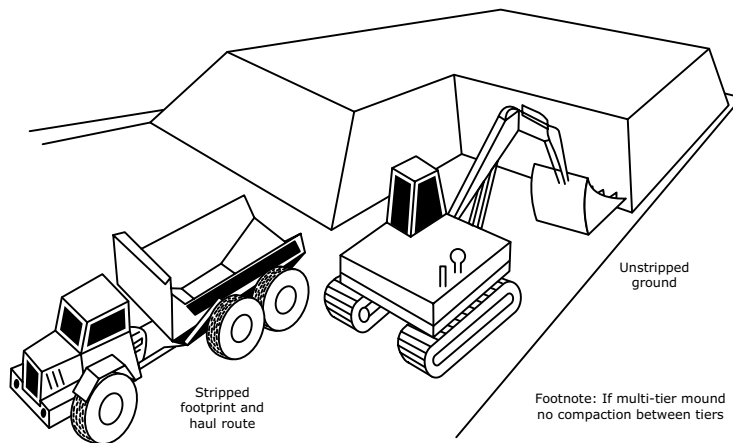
Excavation of soil storage mounds with front loading shovels and dump trucks: Single and multi tier mounds.
